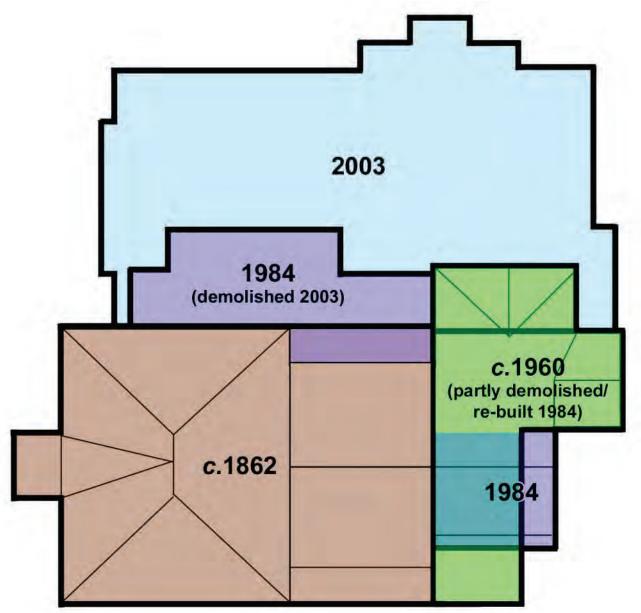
William Barber House construction dates - building outline from: Proposed Site Plan, Old Barber House Ltd., Michael Spaziani Architect Inc., August 28, 2003
